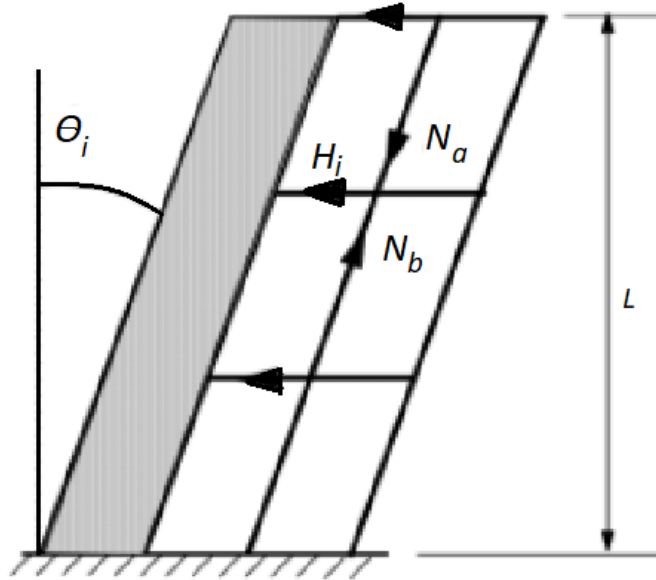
Imperfection load on the stabilising system (Source: [9], edited).
